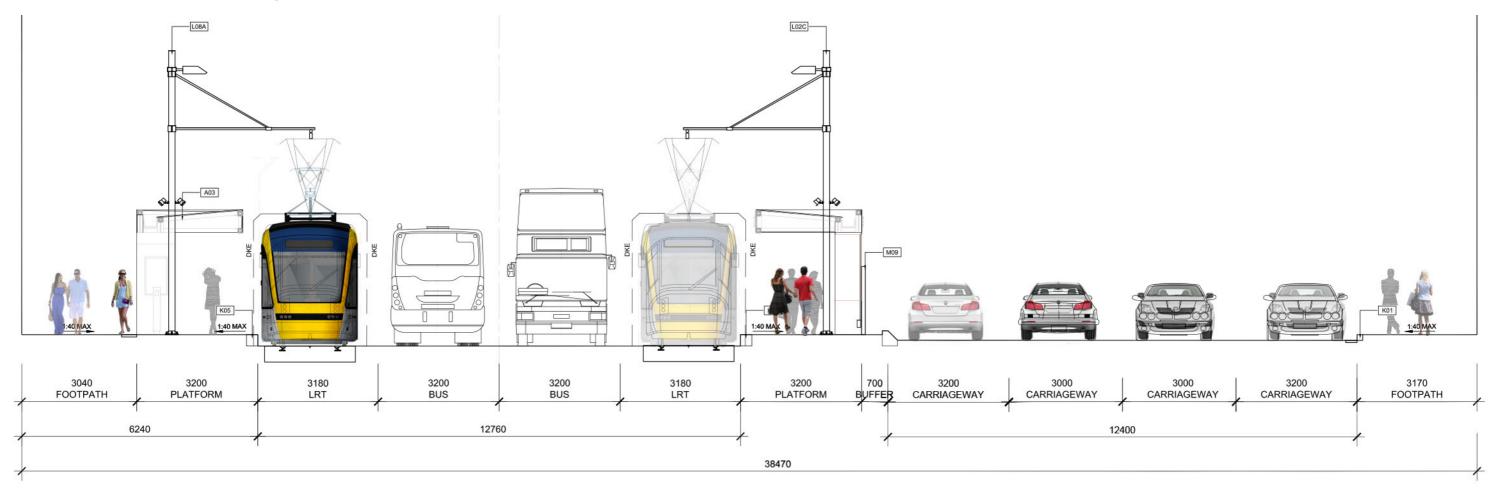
Partial plan and section of Fanshawe Street at bus stop looking east
